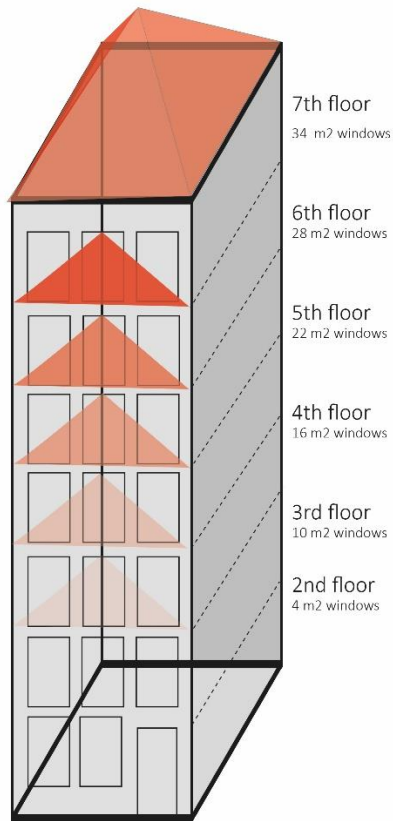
The window surface area of the front façade of a building. For a building with three floors the first and second floor are calculated with windows and the 3rd floor is the roof with no windows.
